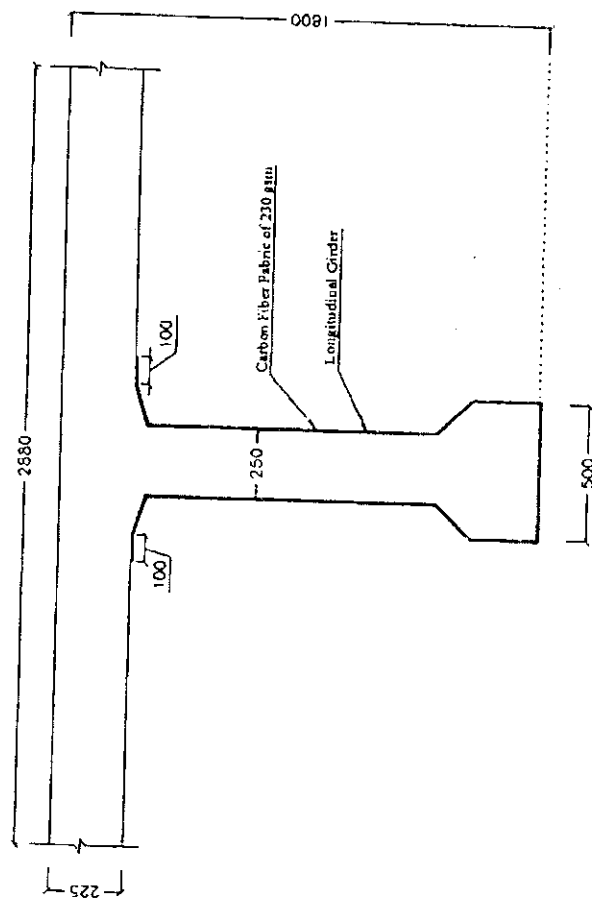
BONDED CARBON FIBER FABRIC IN THE CROSS SECTION OF A GIRDER
